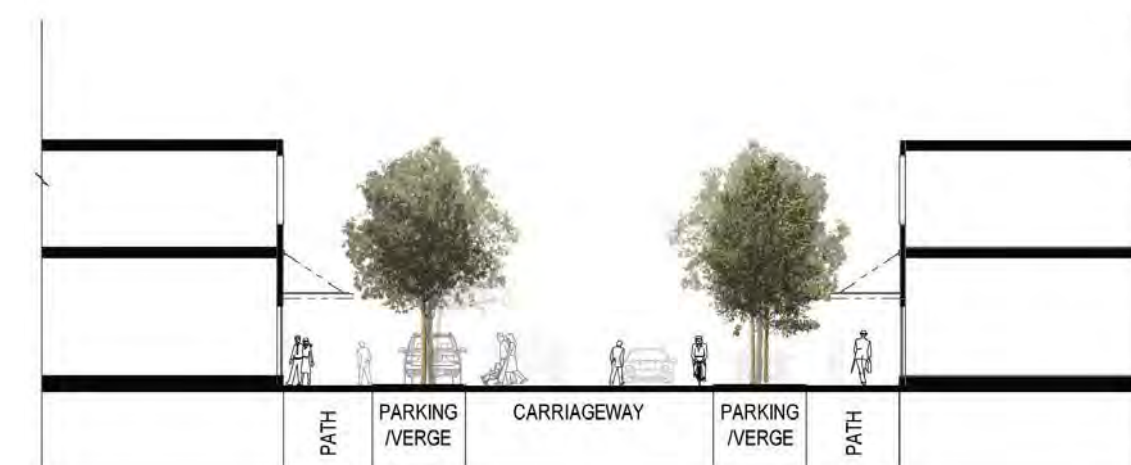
Section BB – Indicative section through Campbell Street neighbourhood centre
